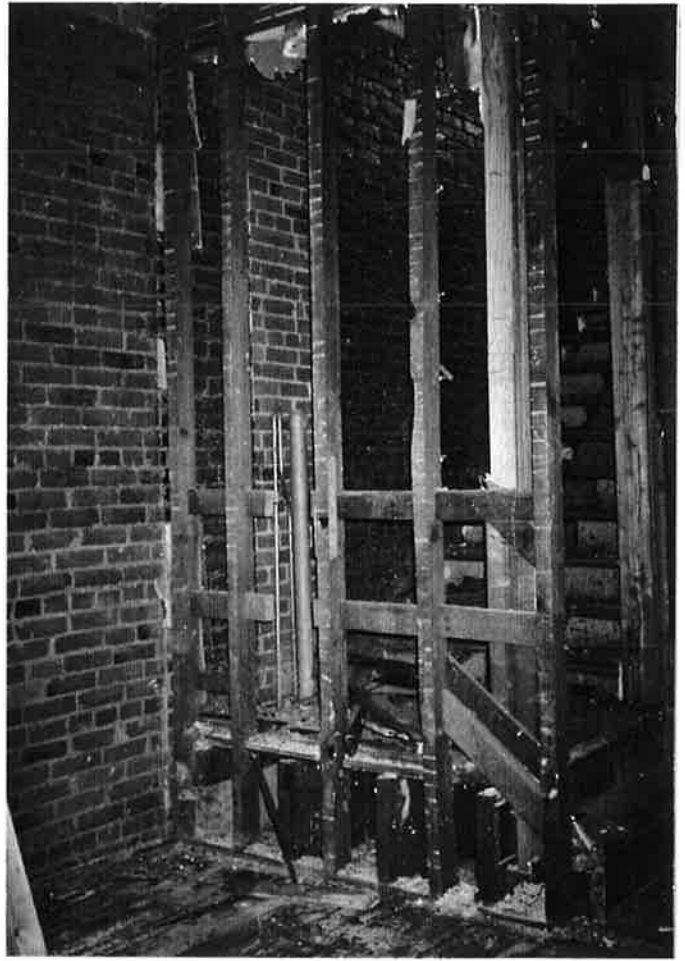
and 19: Second floor, interior looking southwest and detail of window frame, summer 1998.
